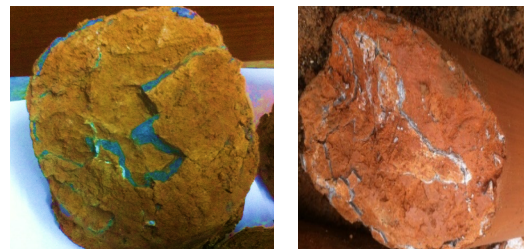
Samples from the strengthened soil mass above mine workings with collapsed roofs.
